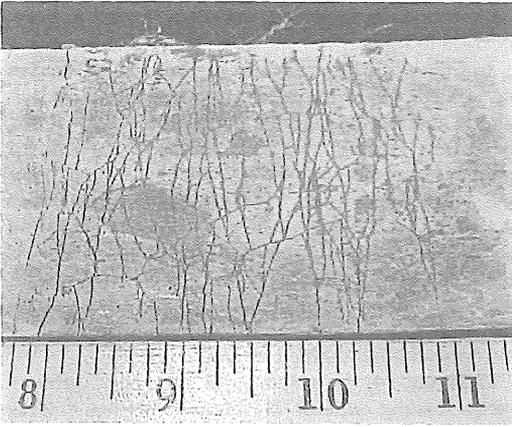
Multi-cracking in ECC tension specimen. (Scale in inches. 1 in. = 25.4 mm)
